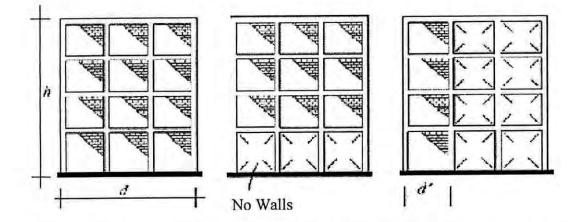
Different arrangements of masonry infill walls in RC frame. (Kaushik et al., 2006)
